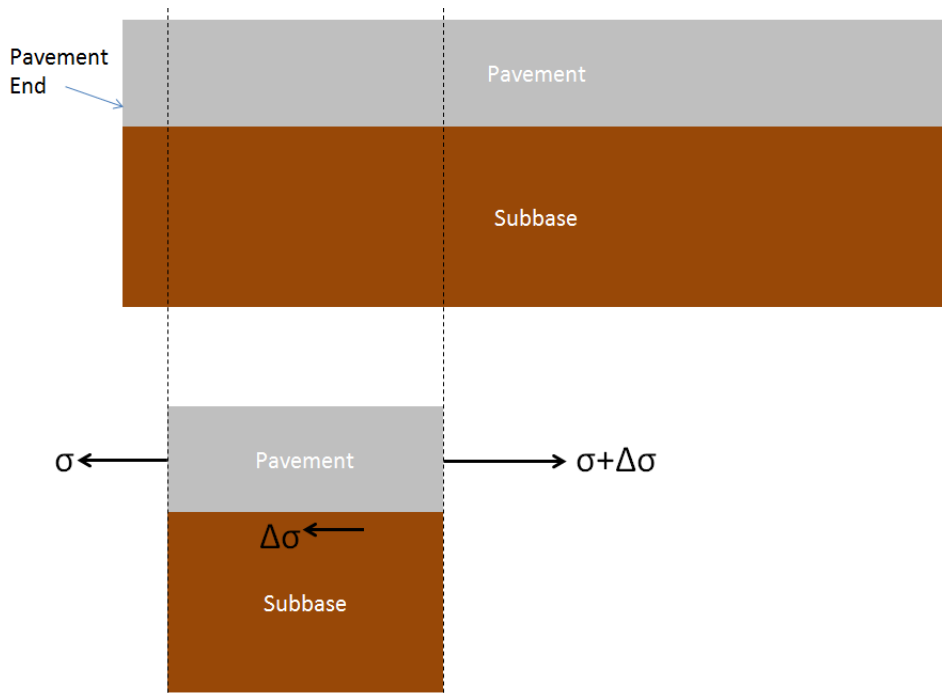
Pavement section showing how pavement stresses build up from subbase friction restraint
